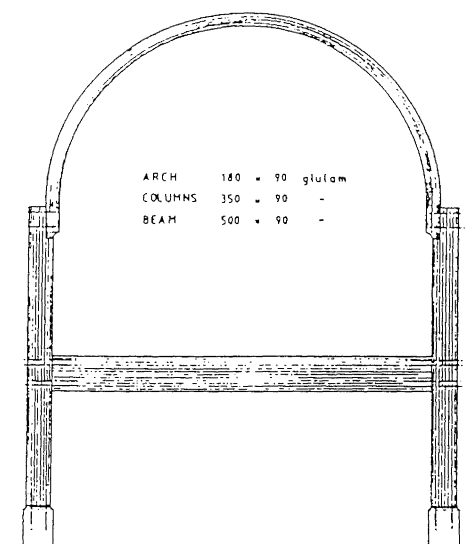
Two storey building with epoxied rods in the beam-column joint.
